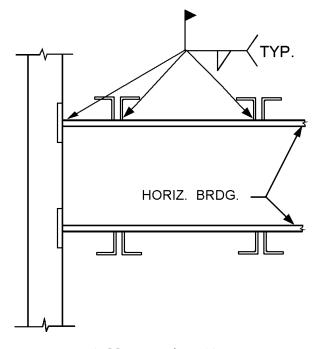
HORIZONTAL BRIDGING TERMINUS AT WALL
